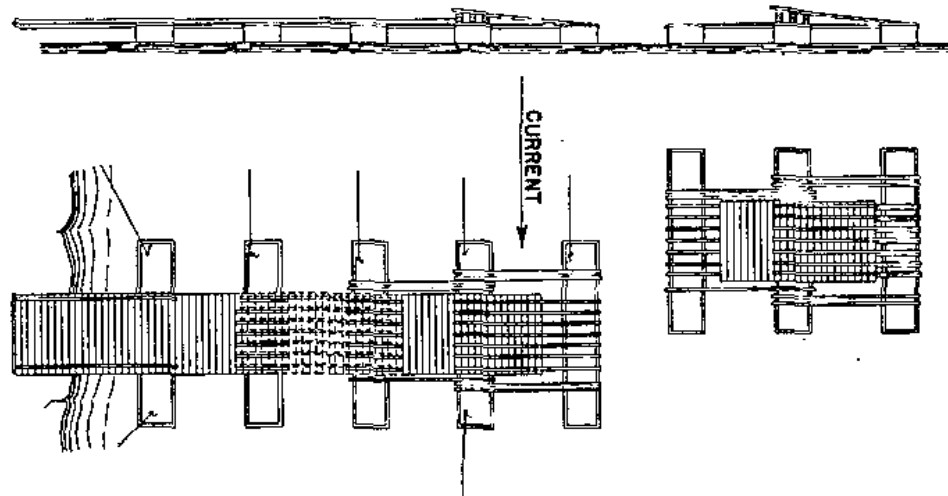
Method of constructing bridge by parts. (First bay may be a trestle bay instead of as shown.)
